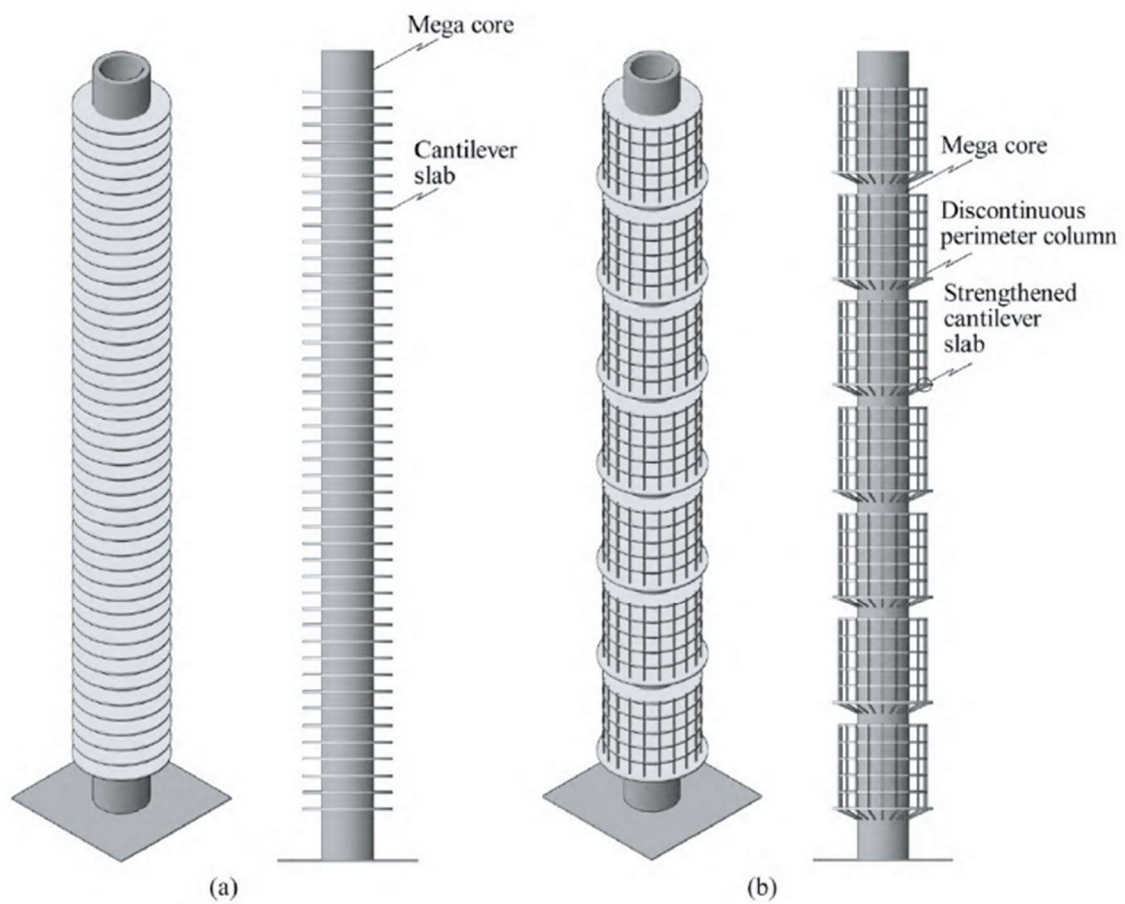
Slabs in the mega core system: cantilever slab (a), supported (b) [13]
